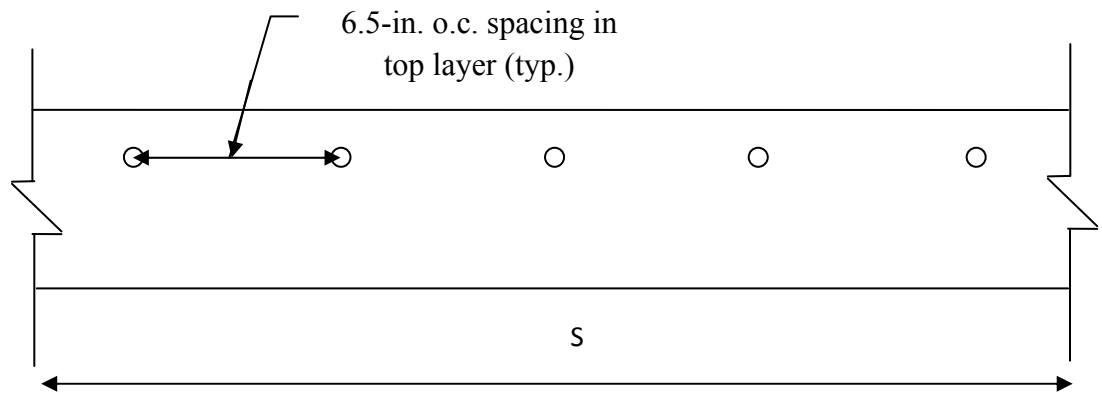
Recommended #6 bar joint reinforcement spacing for standard header design
